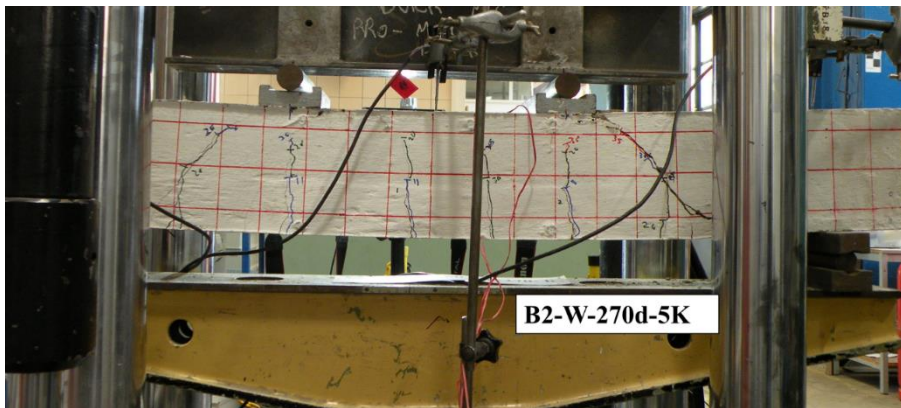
Crack pattern and failure mode of beam1 loaded and stored in conditioned in water at 60°C (B2-W-270d-5k).
